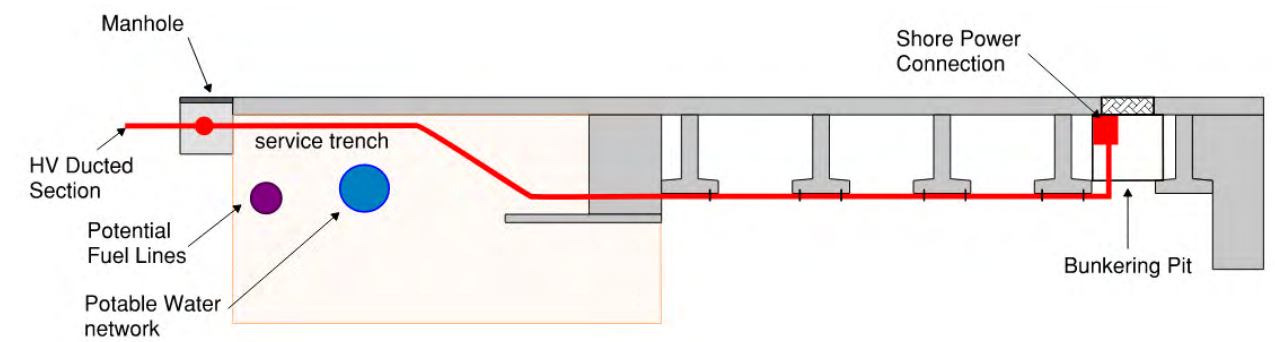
27 Proposed power cables beneath suspended deck (cross section)
